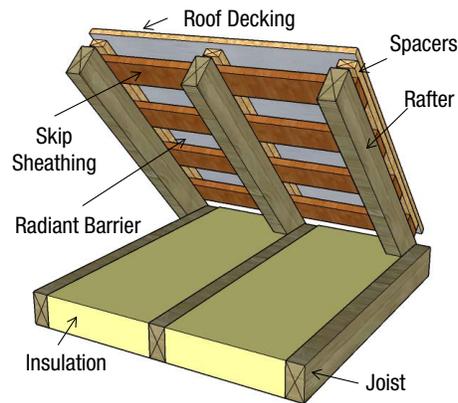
Solid roof decking with radiant barrier laminated to underside installed over spacers and skipped sheathing.
